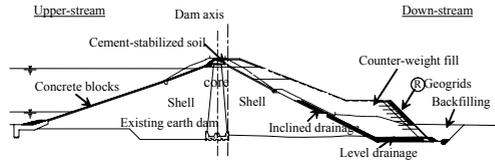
Cross-section of the earth dam for Murayama-Shimo Reservoir after reinforcement works
